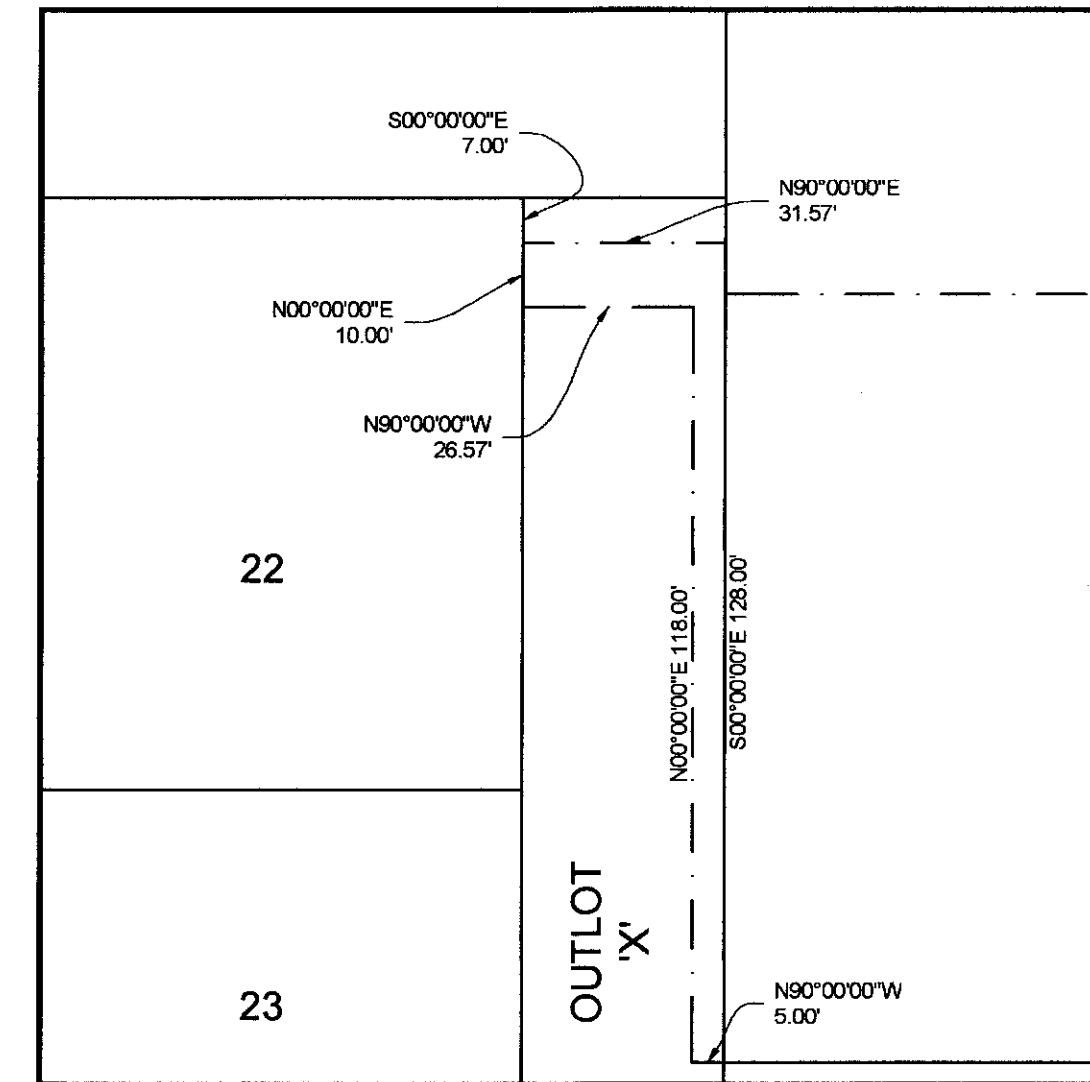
DETAIL J: STORMWATER FACILITY & STORM SEWER EASEMENT
